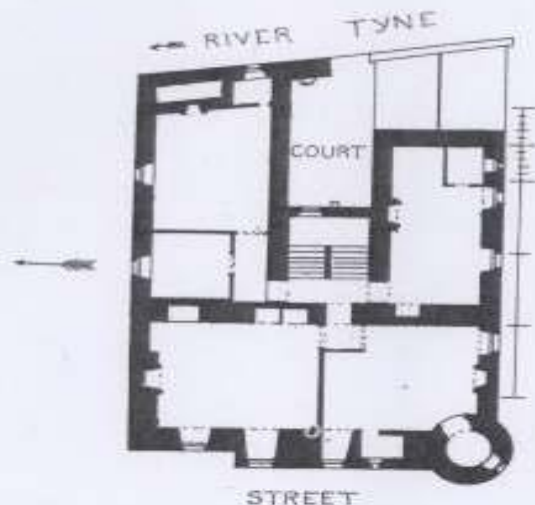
Bothwell Castle. Plan of First Floor.
